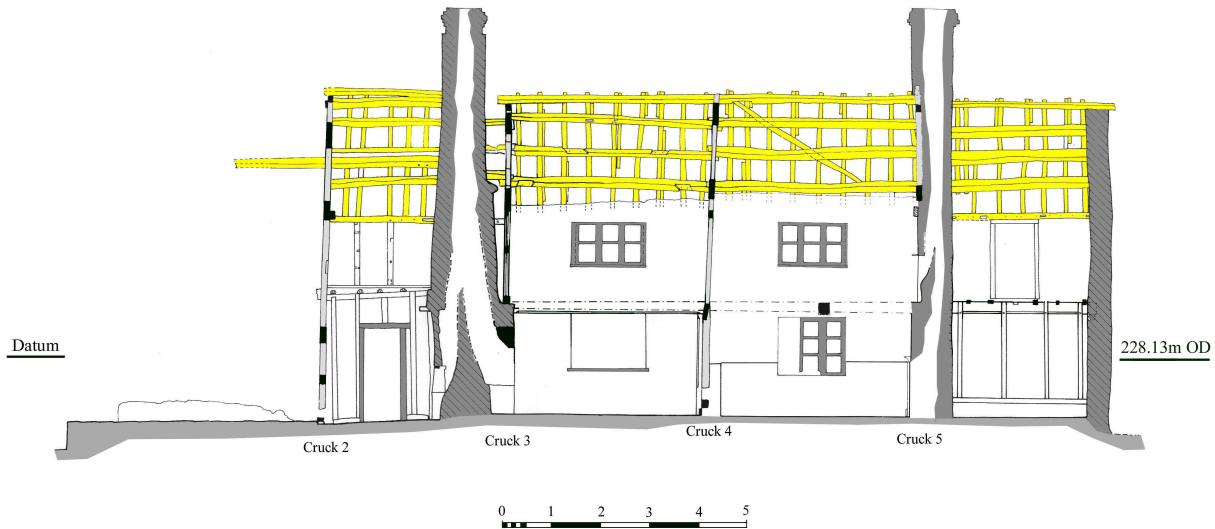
Longitudinal cross section of the house showing the heights of the roof and the passing wind brace. The north stack is to the left of Cruck 3.
